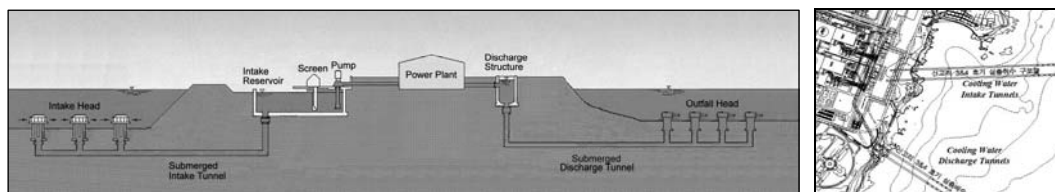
Conceptual profile (left) and plan view (right) showing cooling water intake tunnels applied to the Shin-Kori 3 & 4 units.
